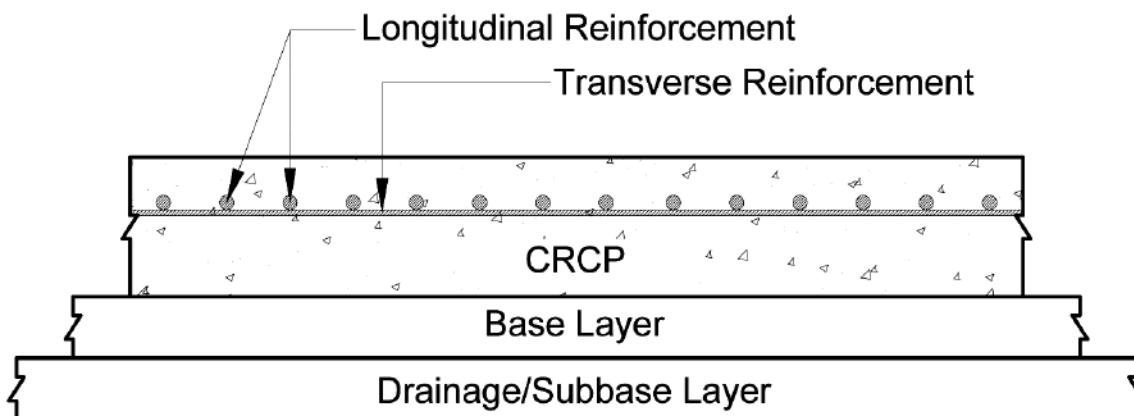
A Typical Cross-Section of Continuously Reinforced Concrete Pavement
